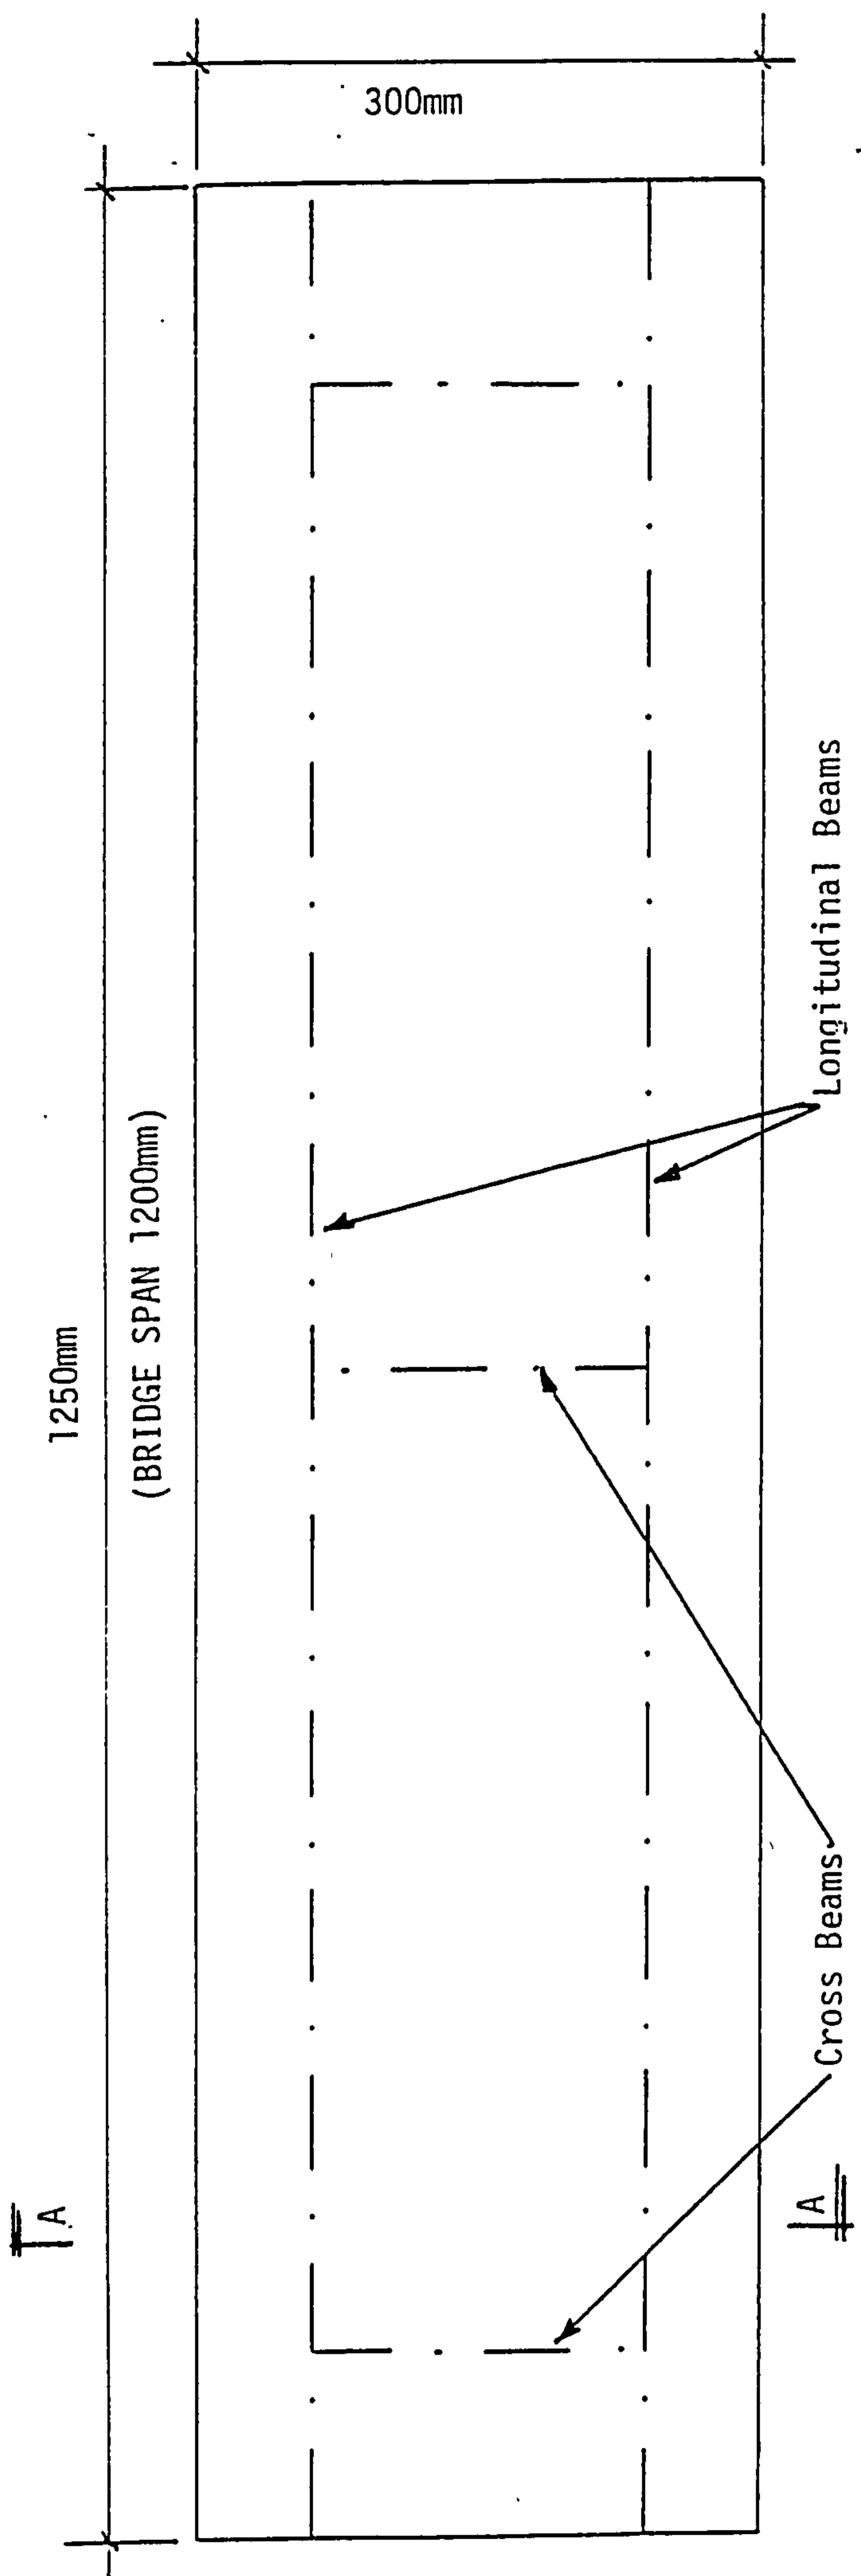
PLAN OF MODEL BRIDGE DECK
